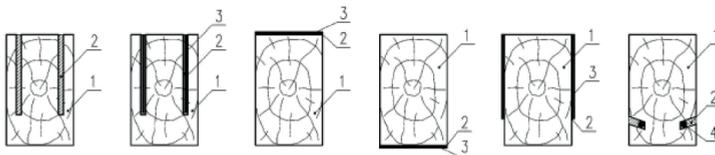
Strengthening of wooden beams using steel sheets and steel rods [5]; 1-wooden beam reinforced, 2- epoxy composition, 3- metal sheet, 4 –steel rod
